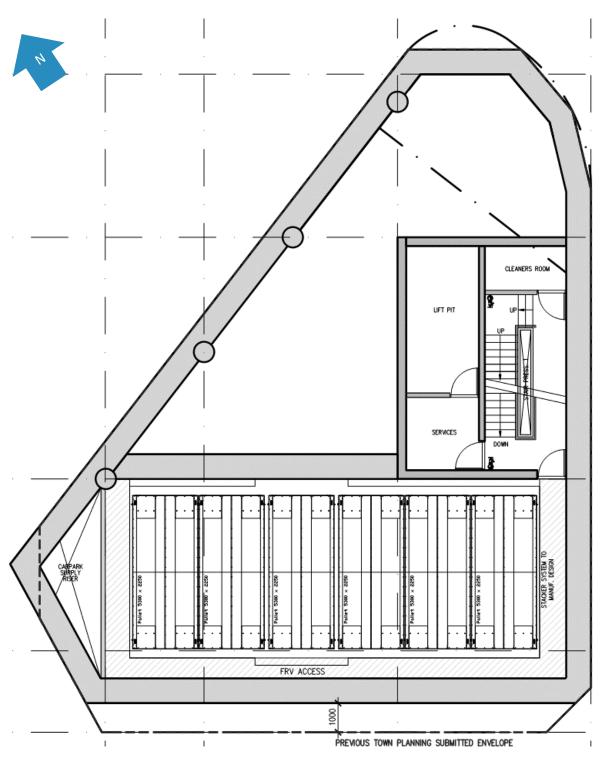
Proposed Floor Plans – Basement 3 (Image Source: Elenberg Fraser)
